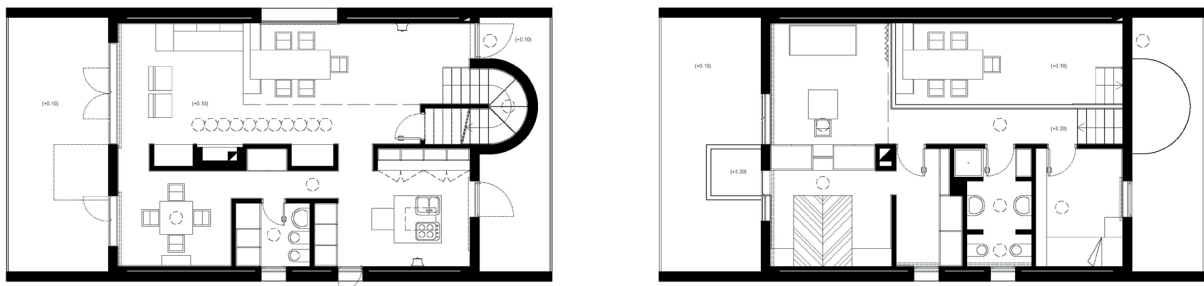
Plans of Twin Villas, from left to right, ground floor and first floor.
